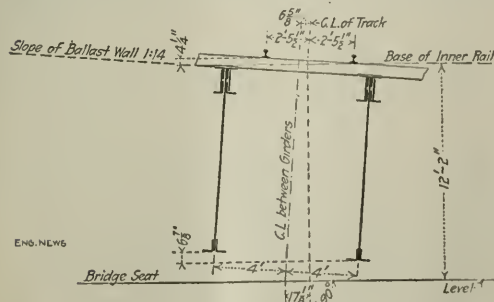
CROSS-SECTION, DECK GIRDER BRIDGE ON CURVE
